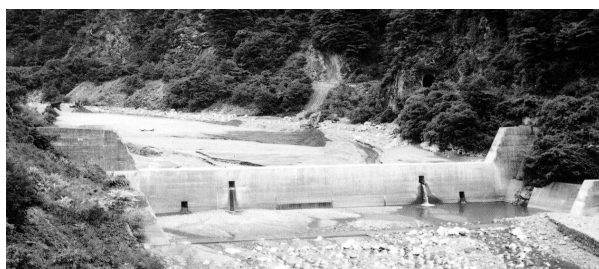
Upstream sediment check dam of Koshibu dam (Constructed in 1978)
